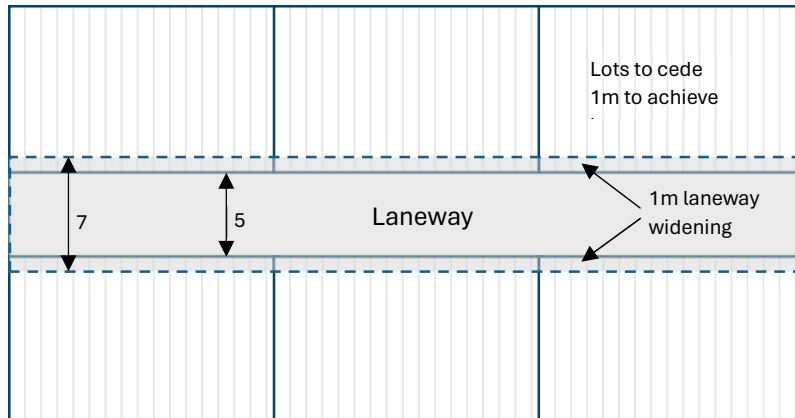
Ceding of land for widening of laneway if all landowners participate.
